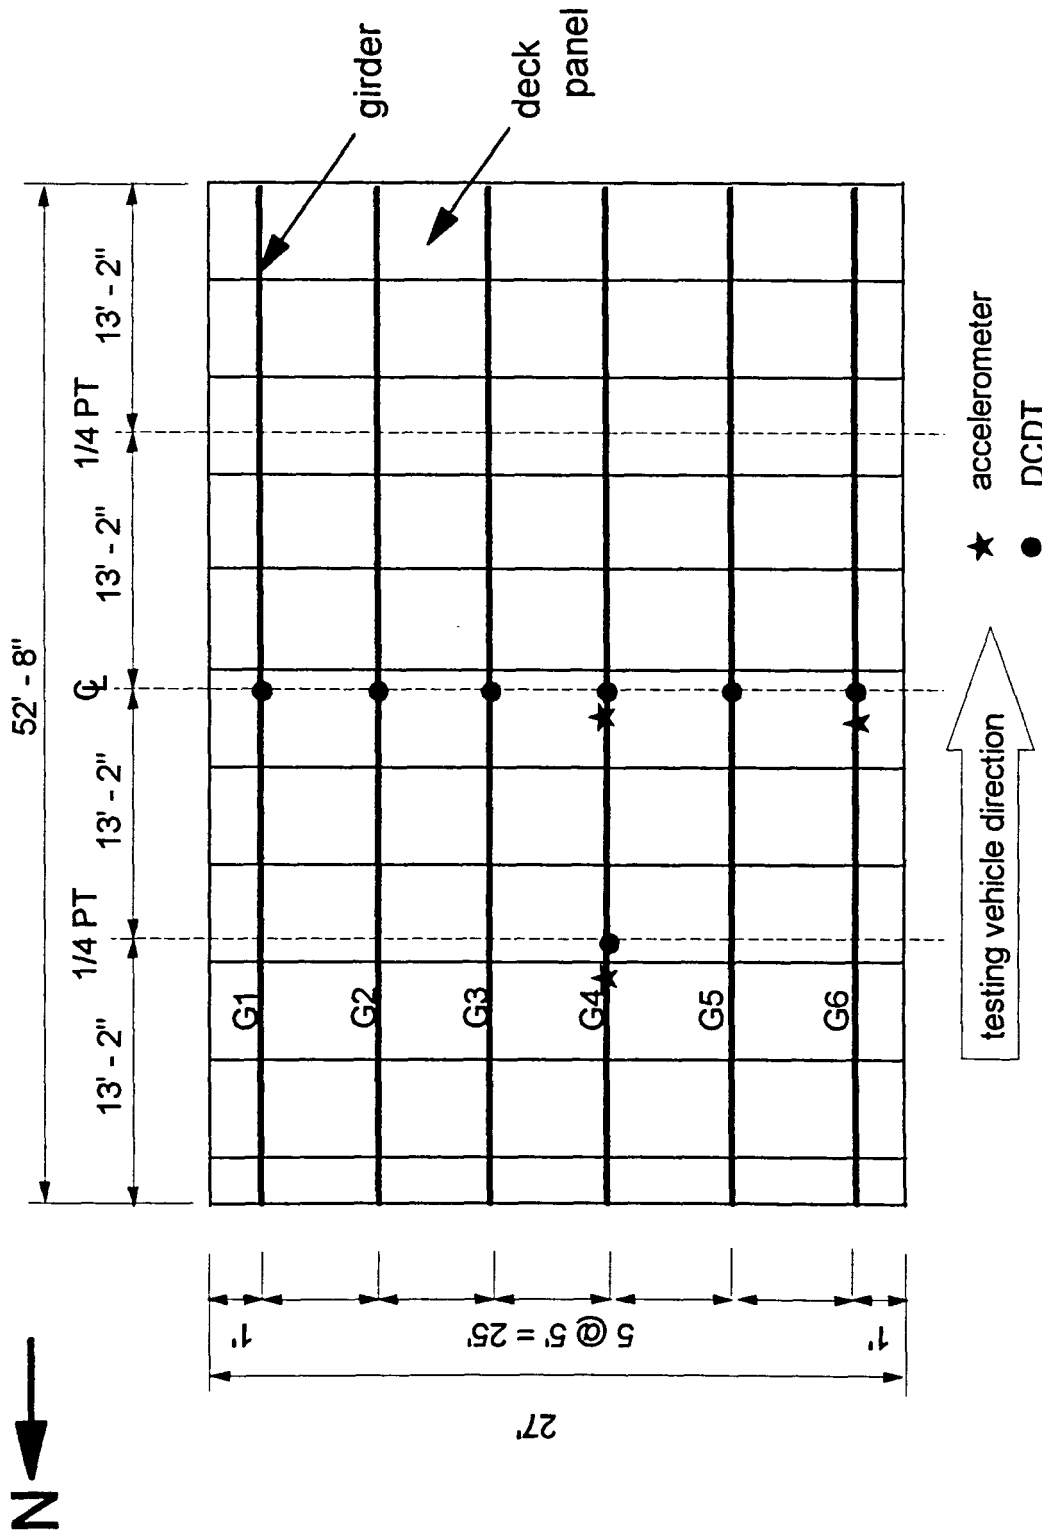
Chambers Co. Bridge : layout and instrumentation
